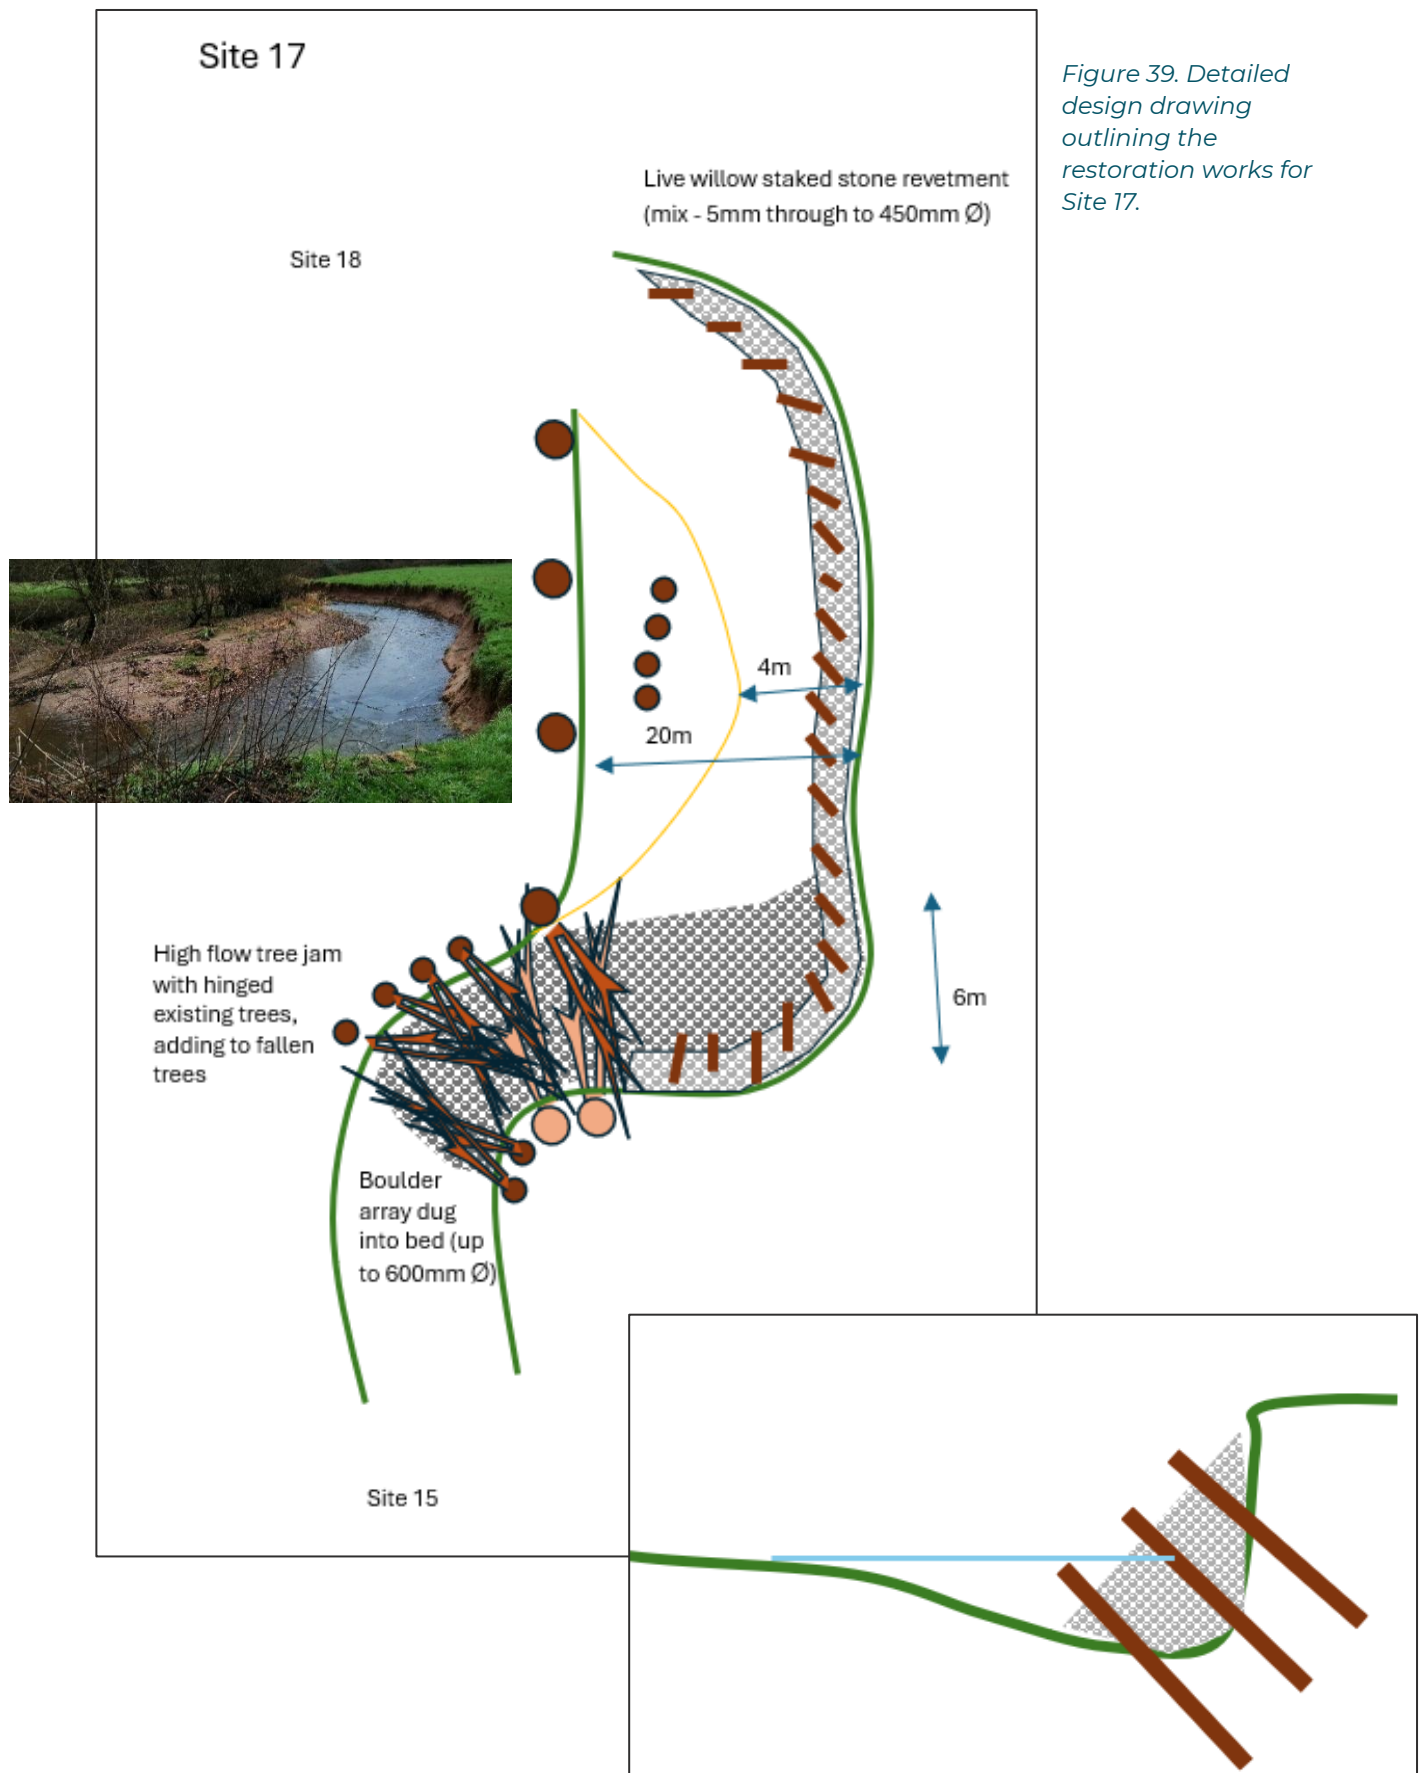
Detailed design drawing outlining the restoration works for Site 17.
